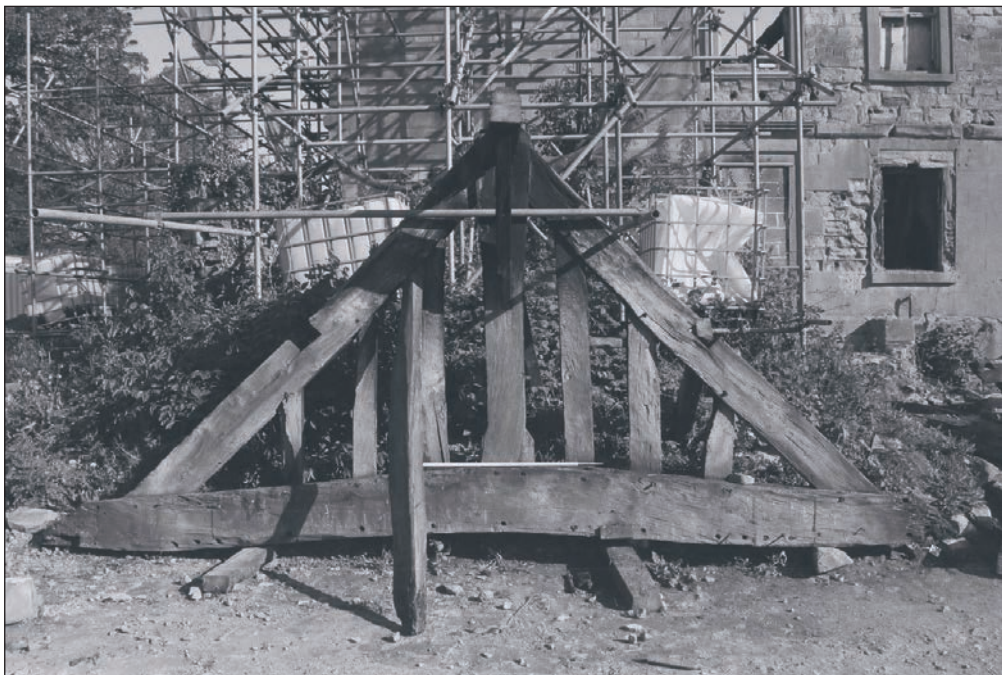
Detail of timber truss during the watching brief once removed from Building 1 (Film 39.15)
